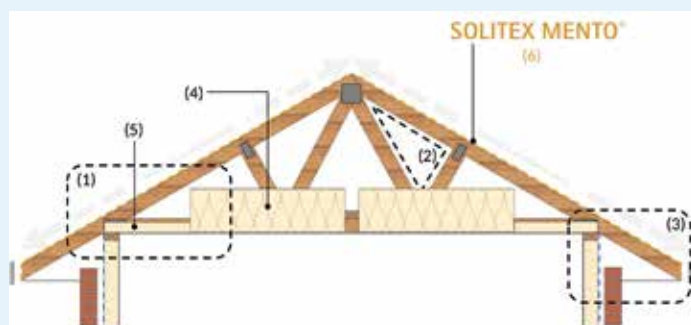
Traditional Truss roof with a modification to insulation layer attempting to prevent moisture wicking into the insulation and cornice as per AS 3999. (1) Perimeter insulation issues, (2) Difficult egress pathway in roof space, (3) Eaves hang lower relative to window head height providing good overall shading for windows, (4) Bulk insulation, (5) SOLITEX MENTO® & ventilated cladding assembly, (6) SOLITEX MENTO® & ventilated cladding assembly
